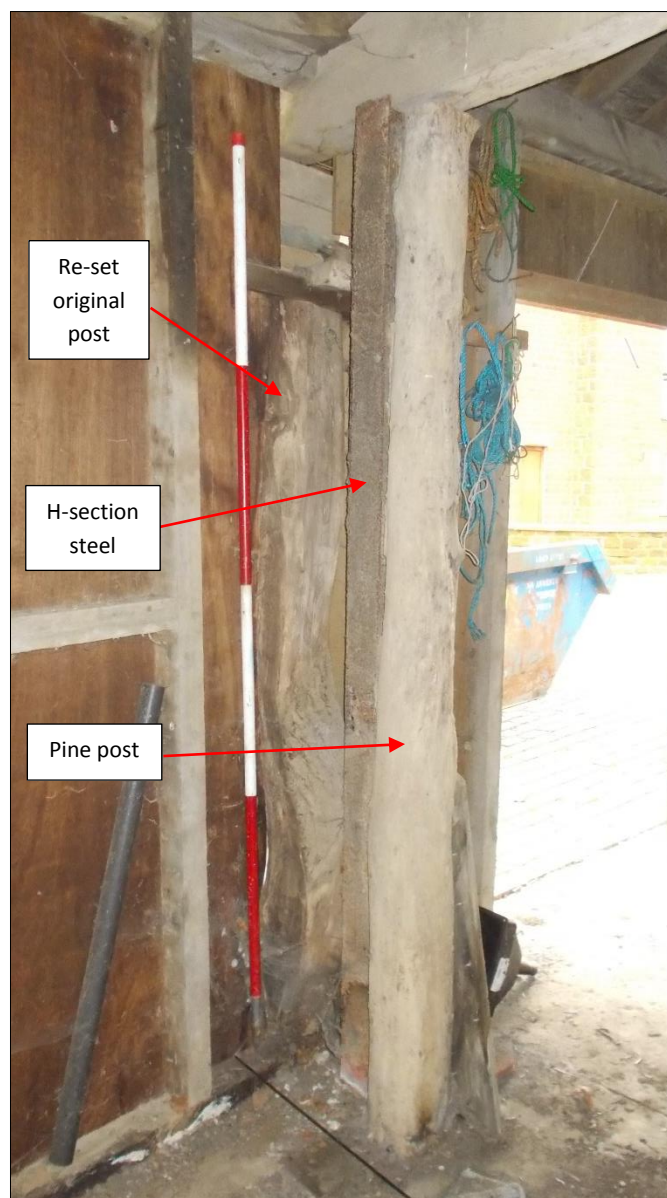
The southern truss supports showing original oak, and secondary H-section steel and pine posts, looking south-west. 2m scale rod.
